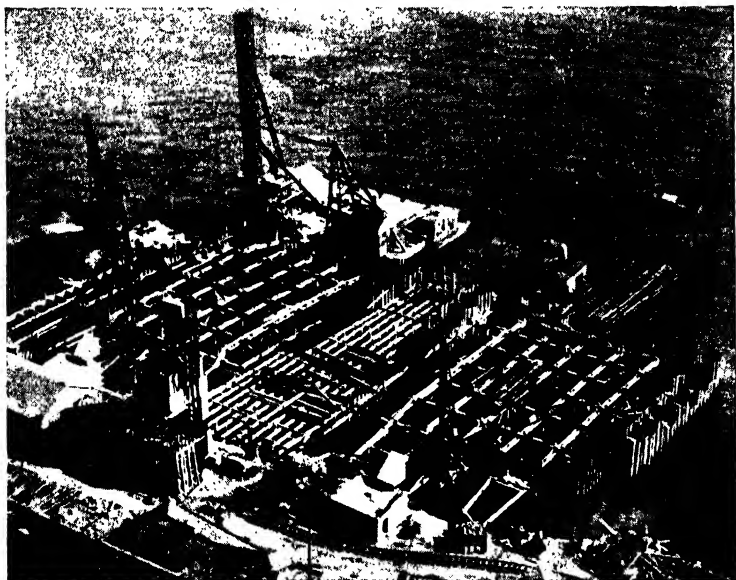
Deep open foundation cofferdam for George Washington Bridge Pier.
